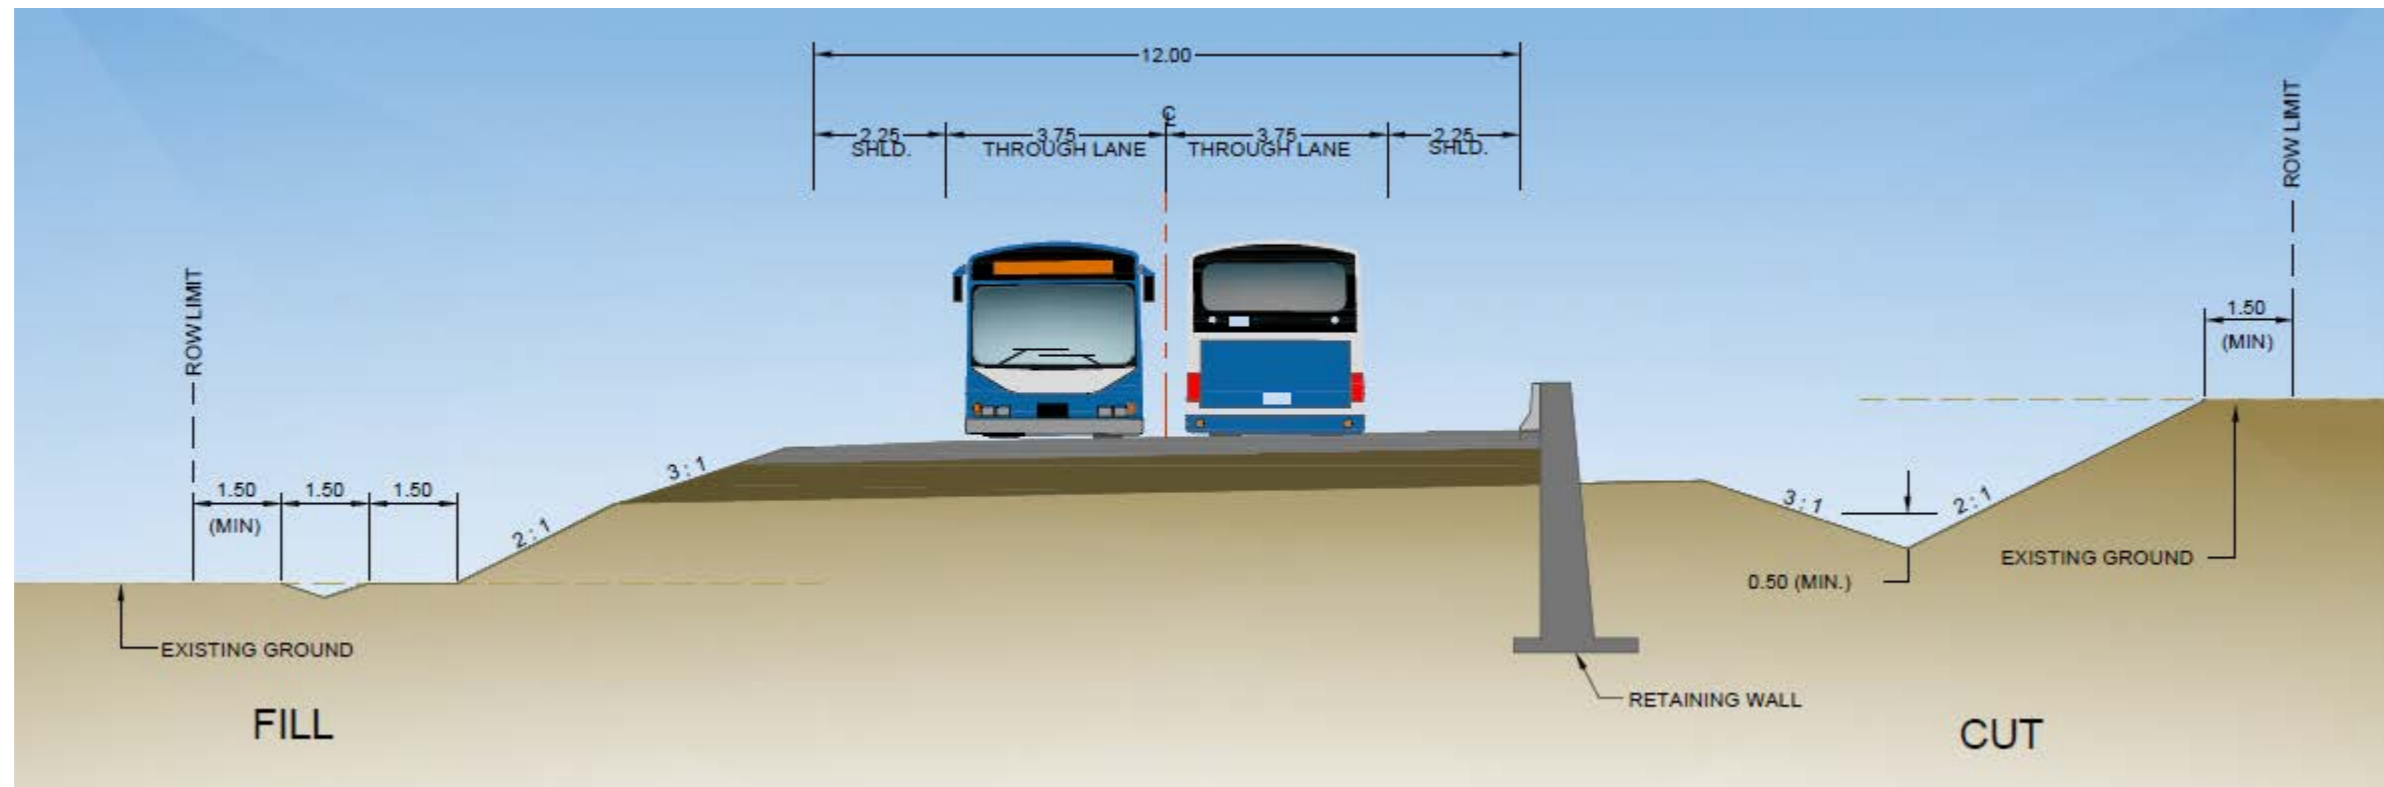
SUPERELEVATED SECTION BETWEEN STATIONS
